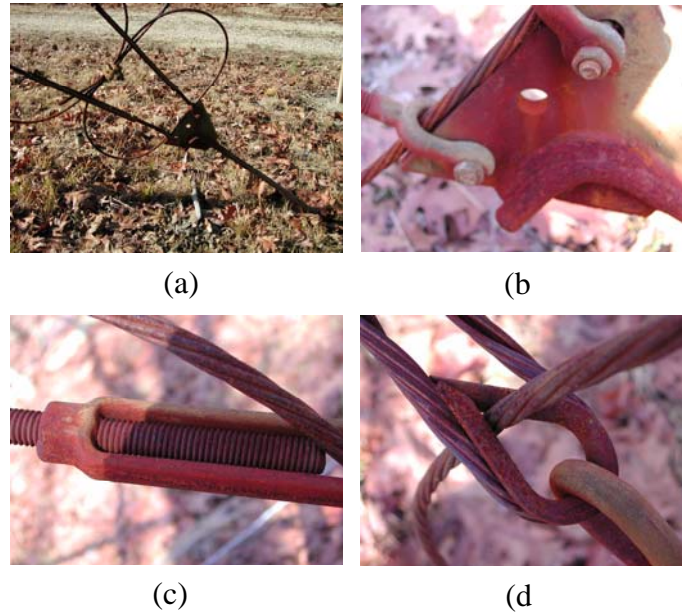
Components of guy anchor system: (a) guy anchor; (b) detail of gusset plate; (c) detail of tensioning system; (d) detail of cable-to-anchor connection.
